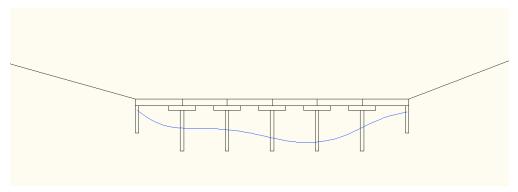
An approximate cross section of the existing Flagstone Bridge.
